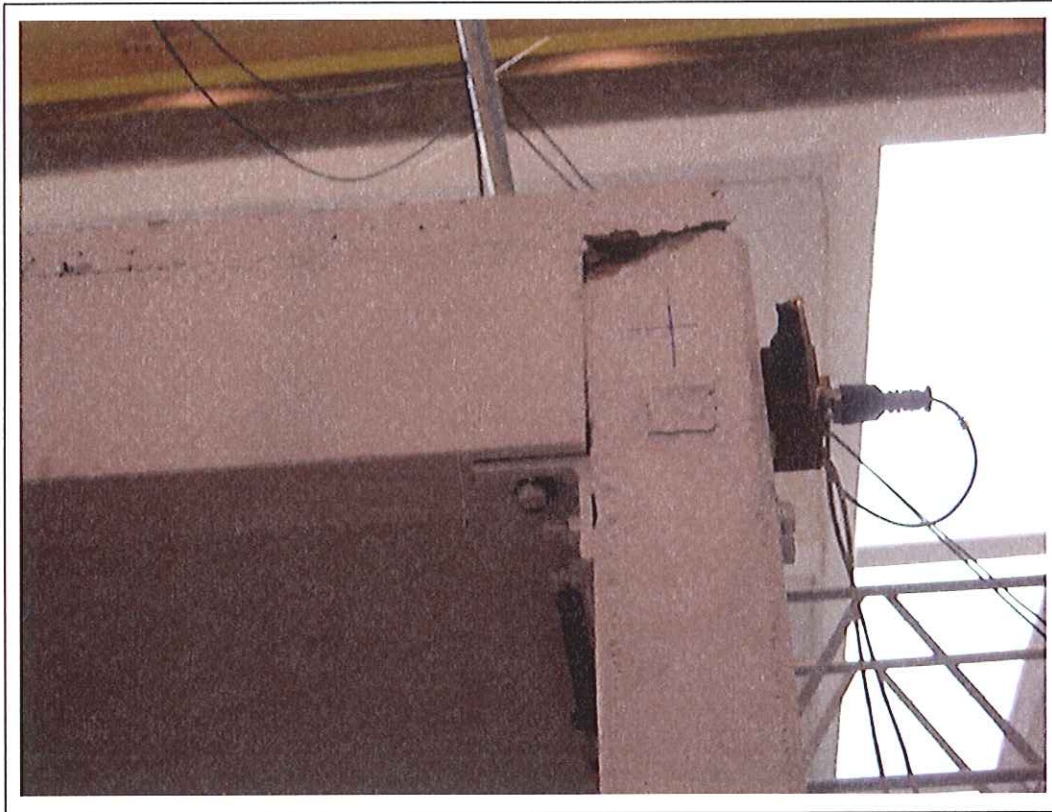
Detail of the beam-column connection after the test (J7-Trans.)
